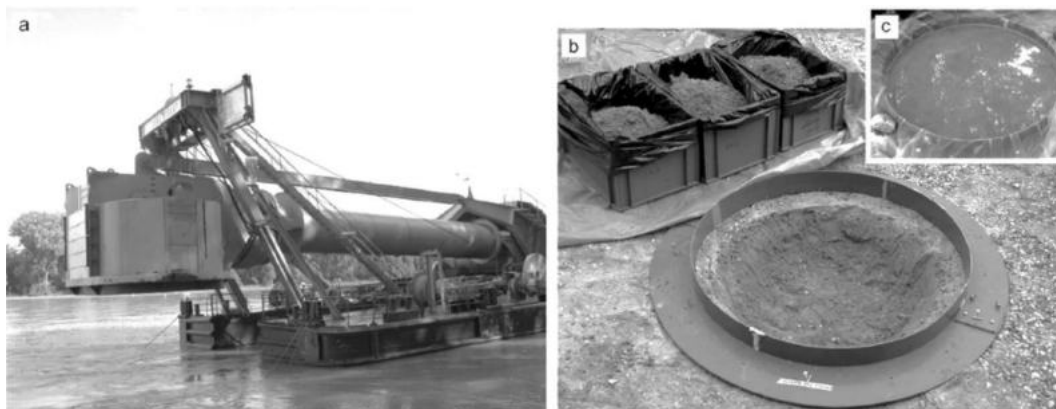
Example of application of water replacement method. Diving bell on the left picture; excavated hole and extracted sediment as well as covered excavation hole on the right picture.
